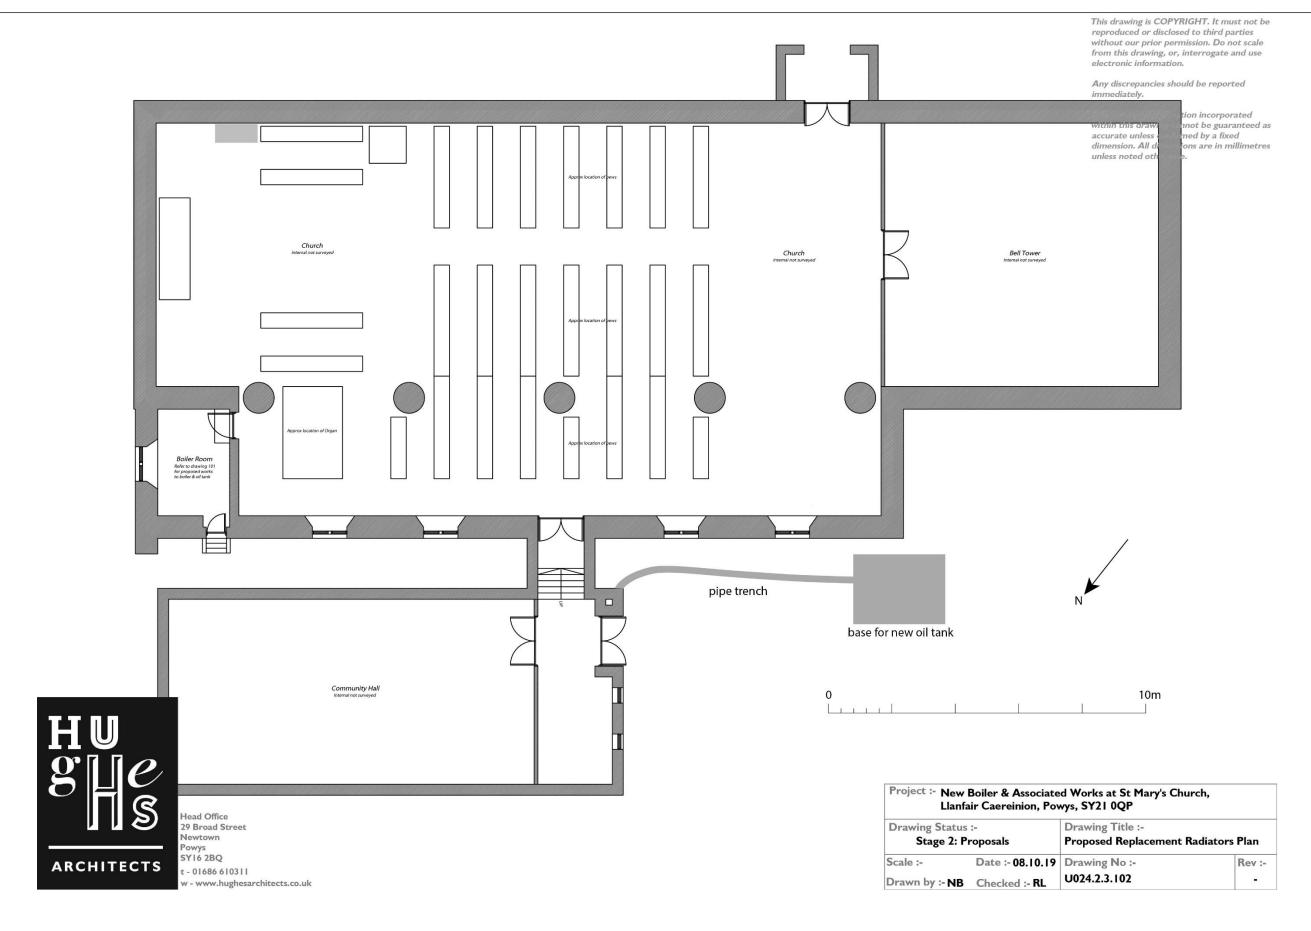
Plan of St Mary's Church, showing the location of the new oil tank and pipe trench
